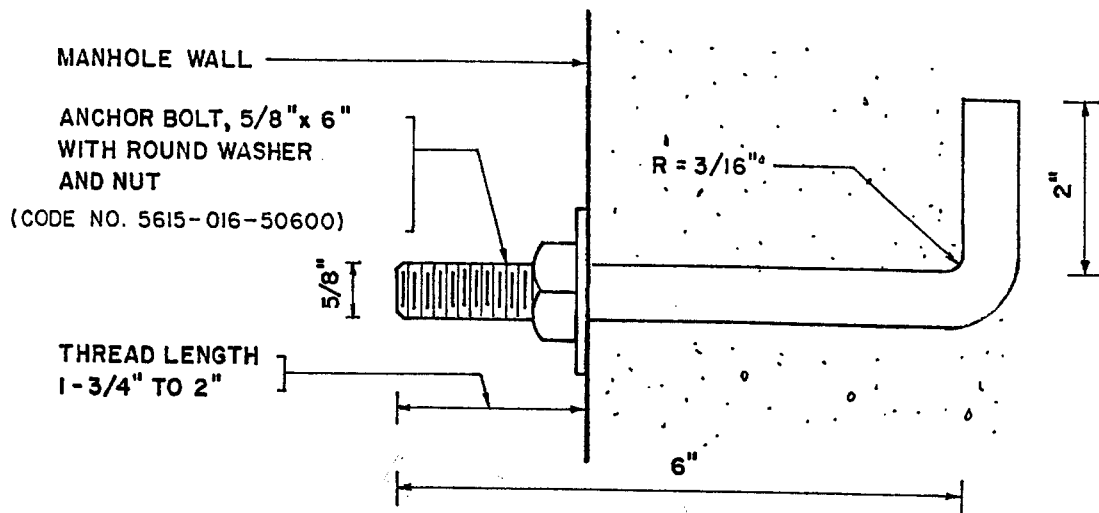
ANCHOR BOLT INSTALLATION (TYPICAL)
